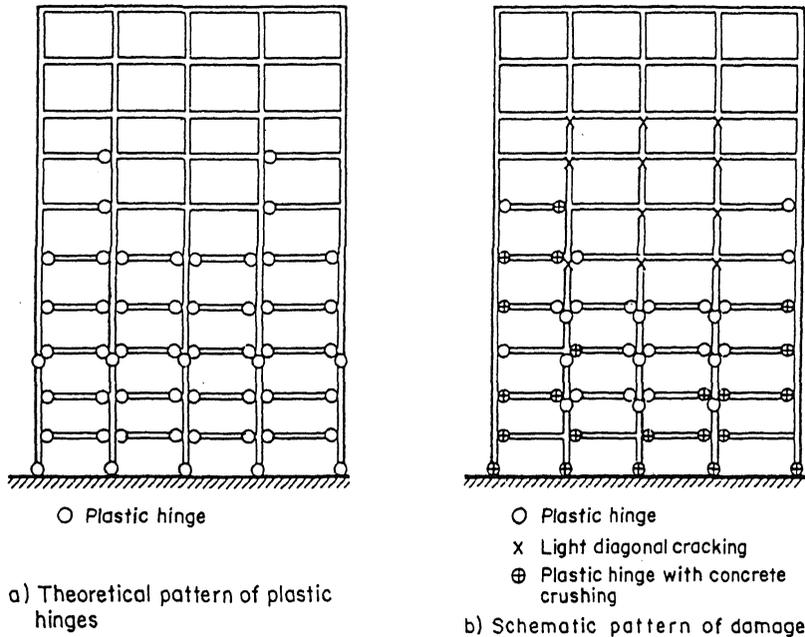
Theoretical and observed patterns of damage for a typical longitudinal frame of the office building
